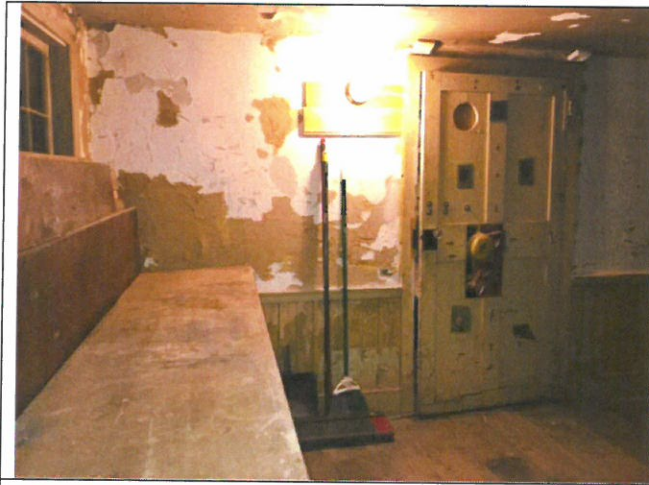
Area A, Room 101, looking east. Original/early wainscot, plaster, door.
